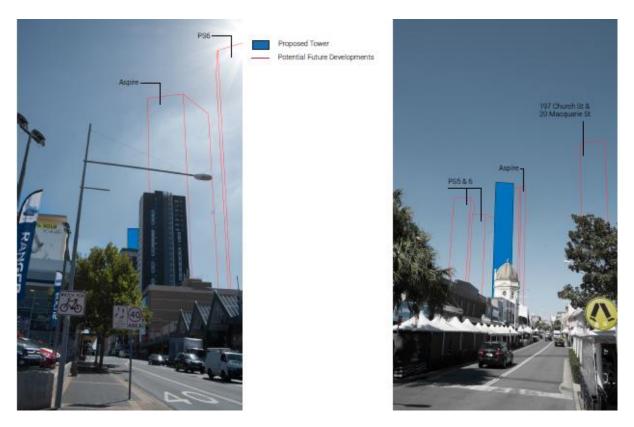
Looking north along Church Street and Great Western Highway and looking South along Church Street
